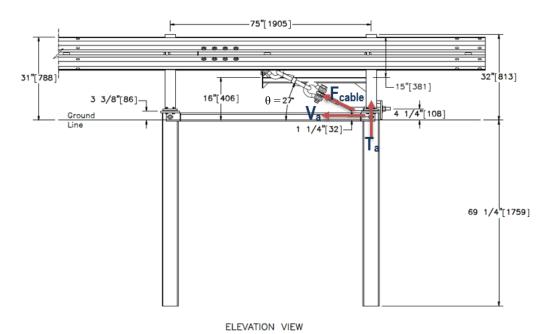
Steel-Post, Trailing-End Anchorage Design Concept No. 1
